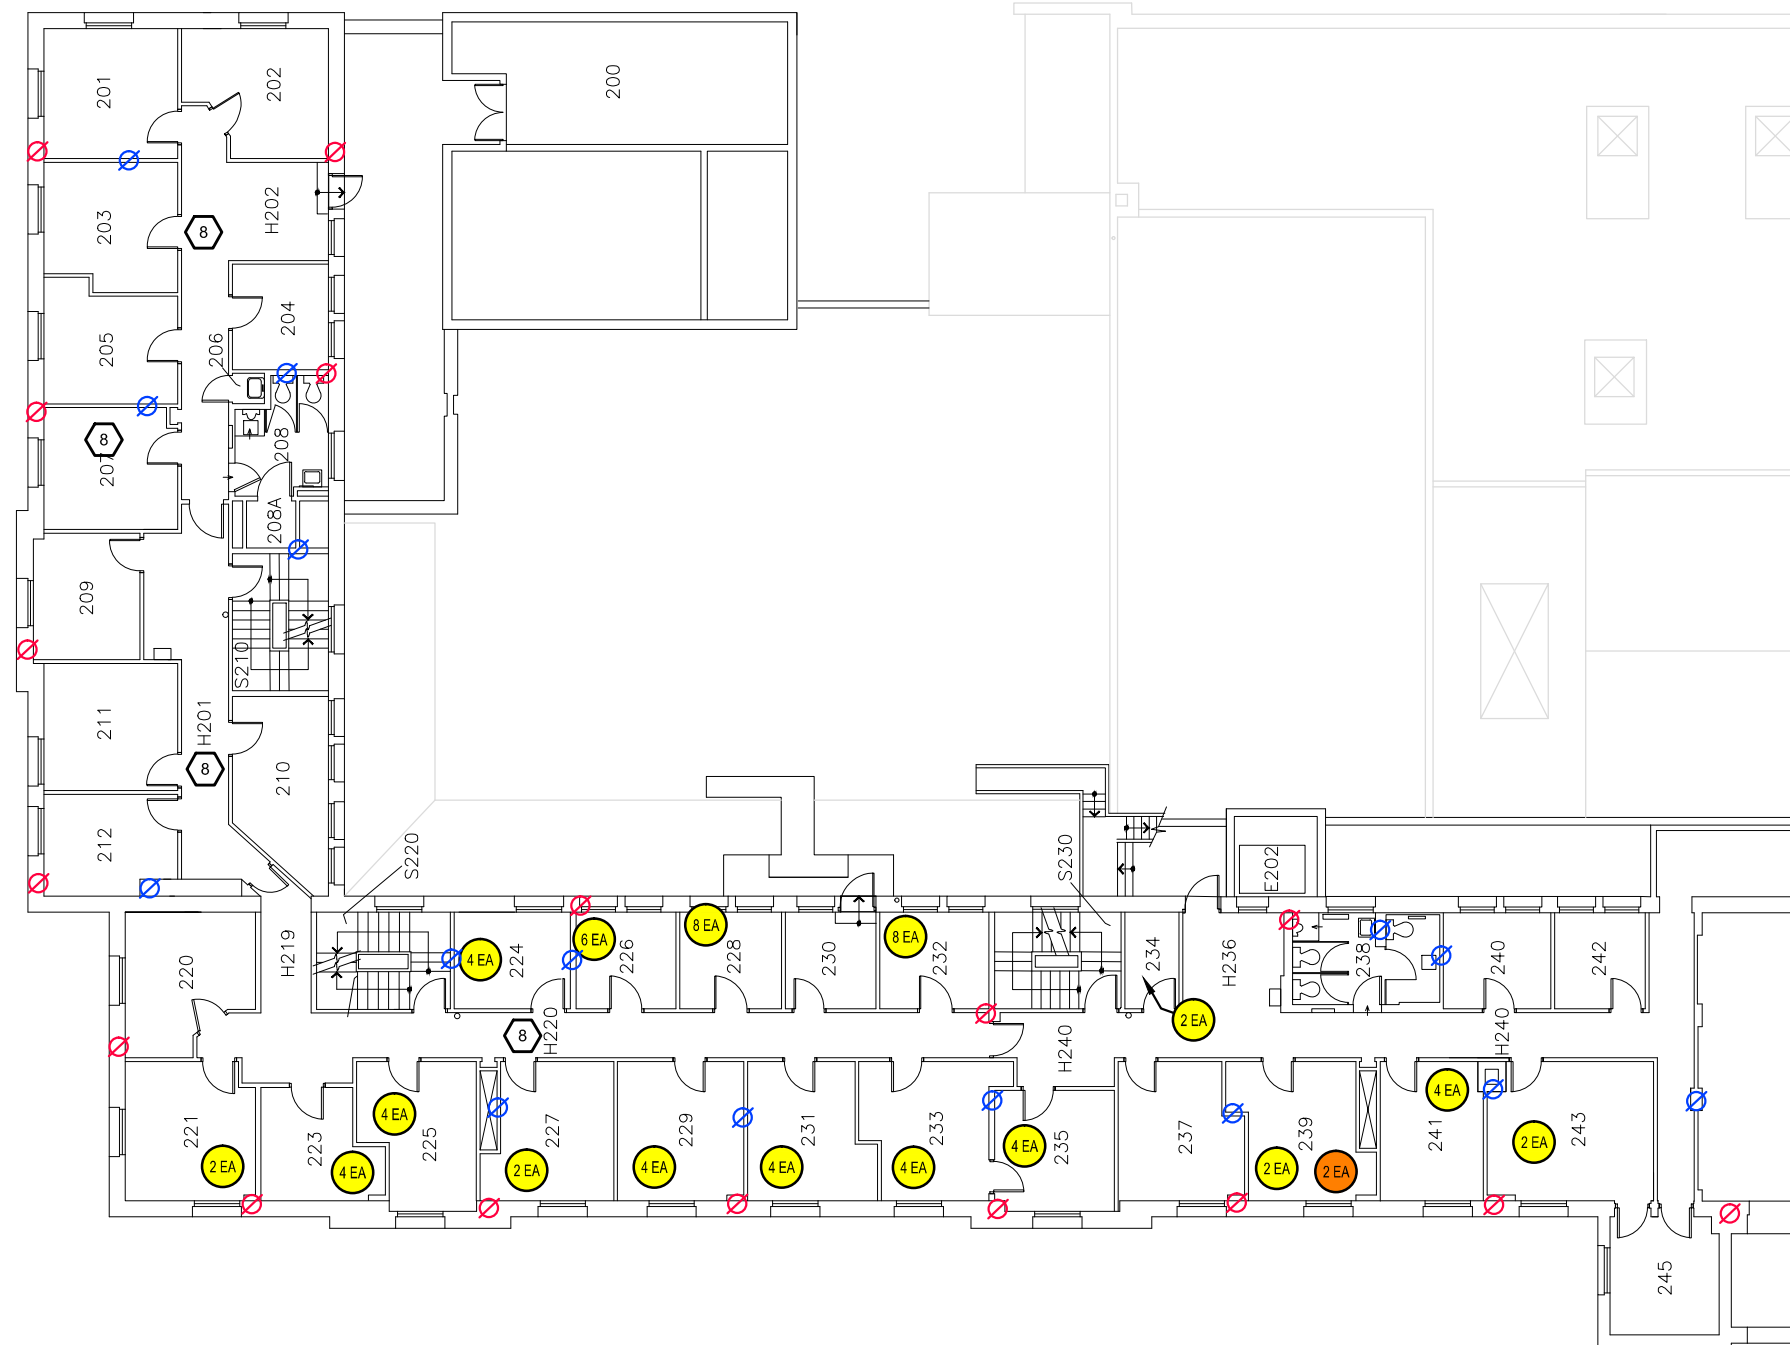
STRAUB HALL - SECOND FLOOR - NORTH HALF
